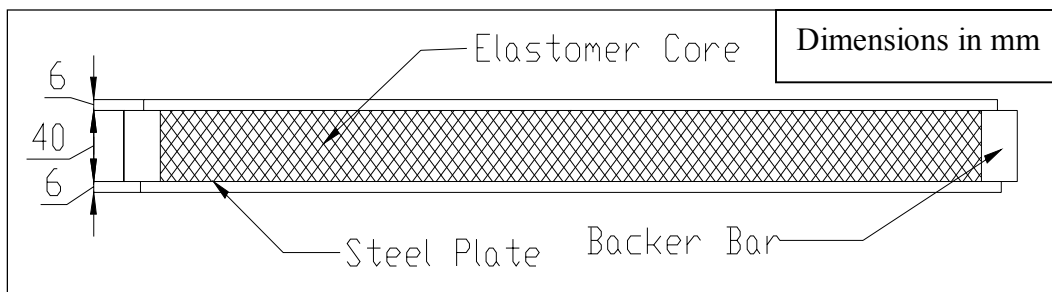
SANDWICH PLATE BRIDGE DECK
